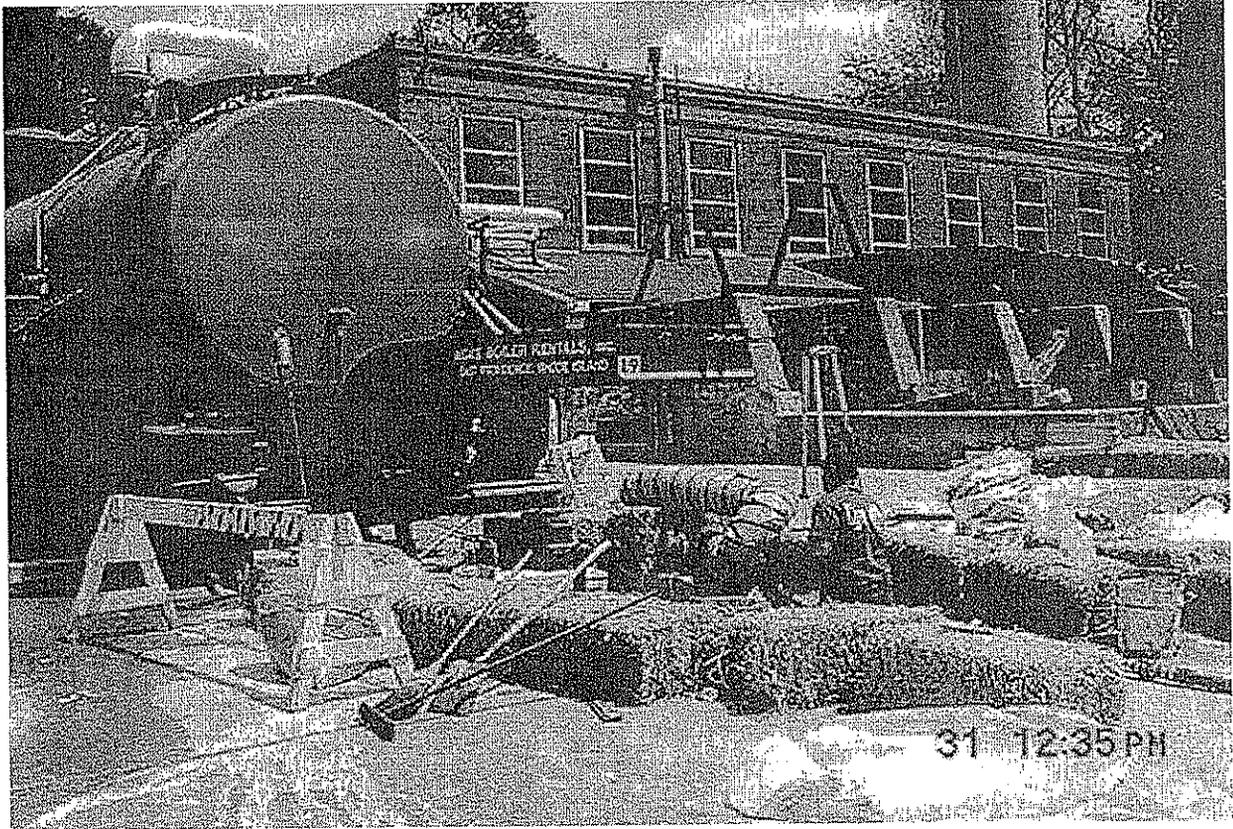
Site Overview showing excavation of Tank 2 end wall
